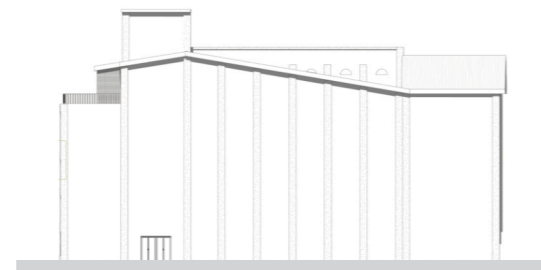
West Elevation of St James Theatre, facing Queens Street.
